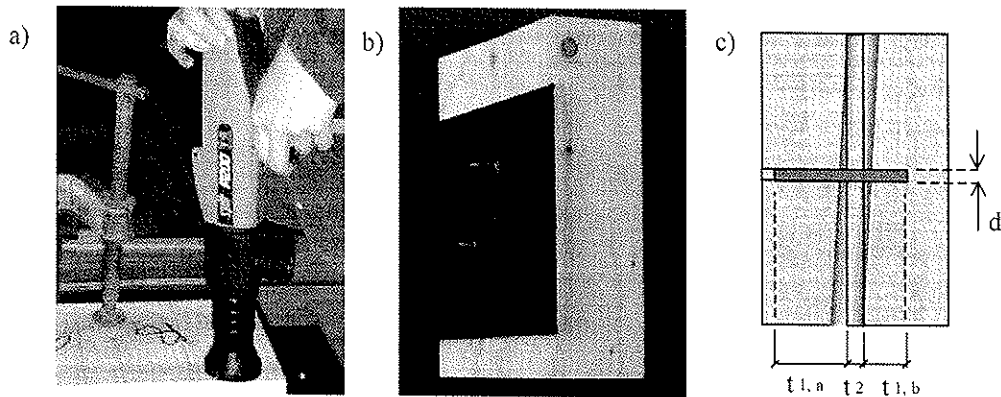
Shot Fired Nail System Used In Timber/Steel Connection
